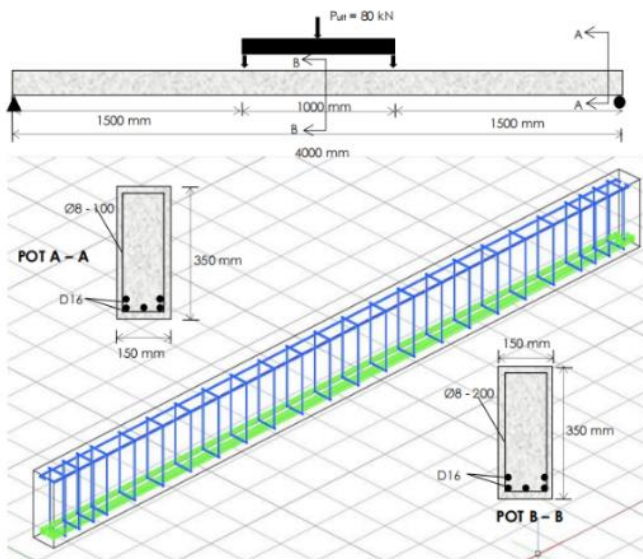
Longitudinal reinforcement of GRC beam and CRC beam [56]
